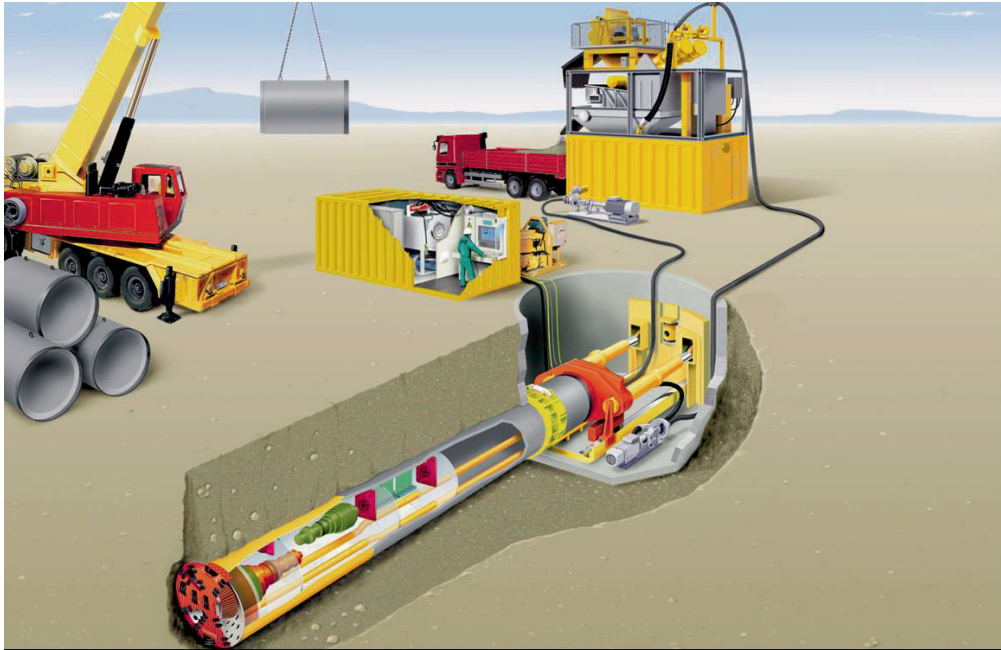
Typical pipe jacking set up). (Scheme: Herrenknecht)
